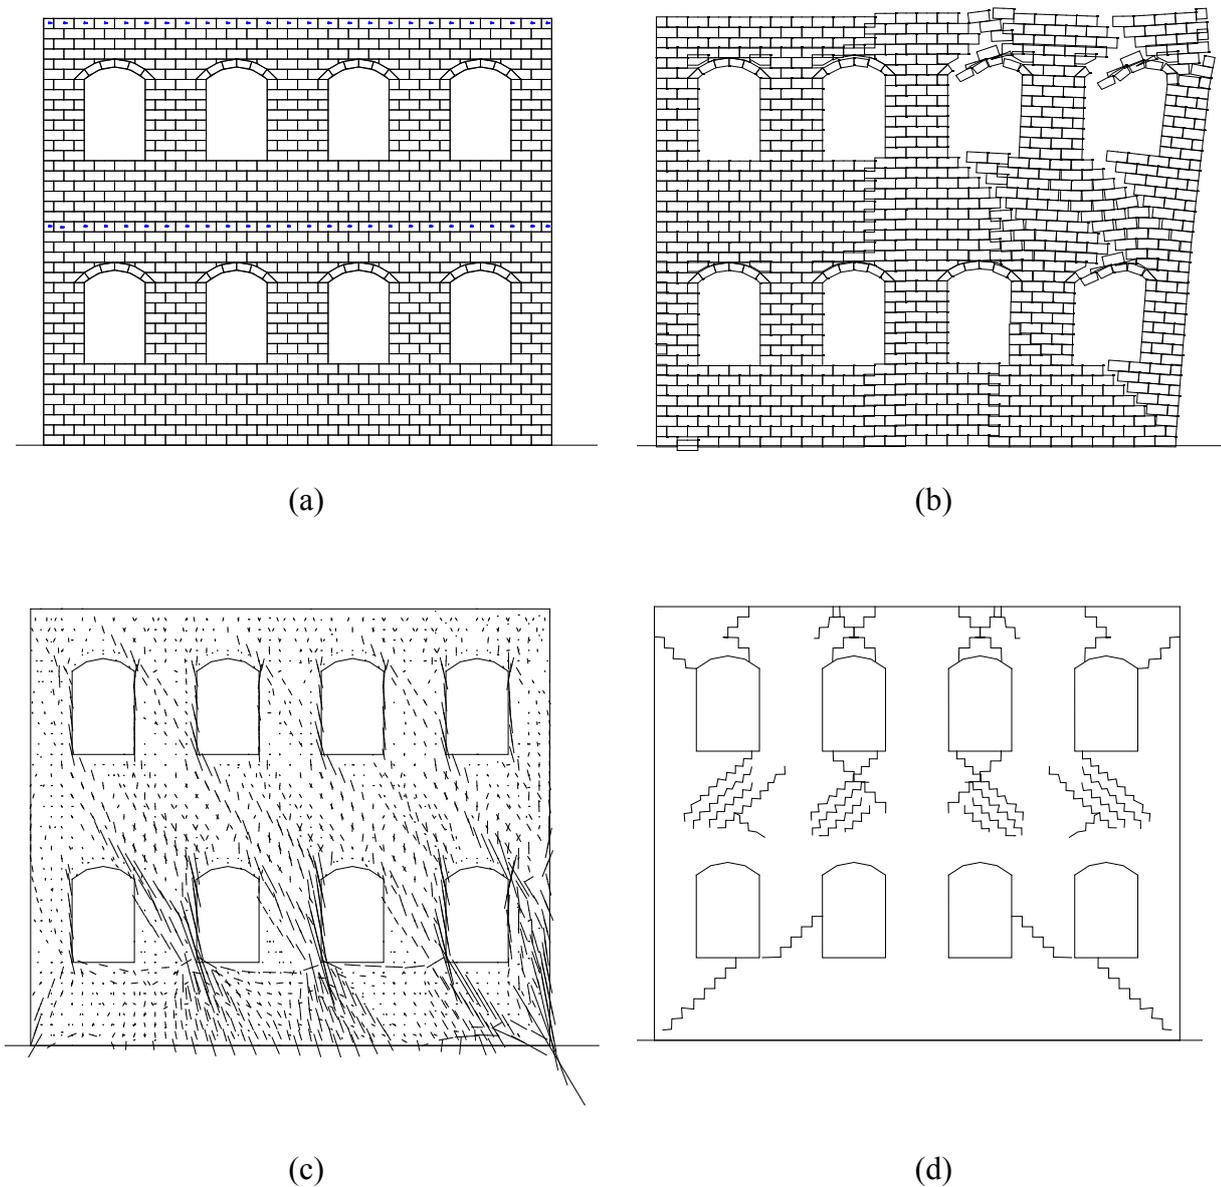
Addition of a Pier to the Standard Masonry wall 2; Seismic coefficient,  $\alpha=0.578$ ,
